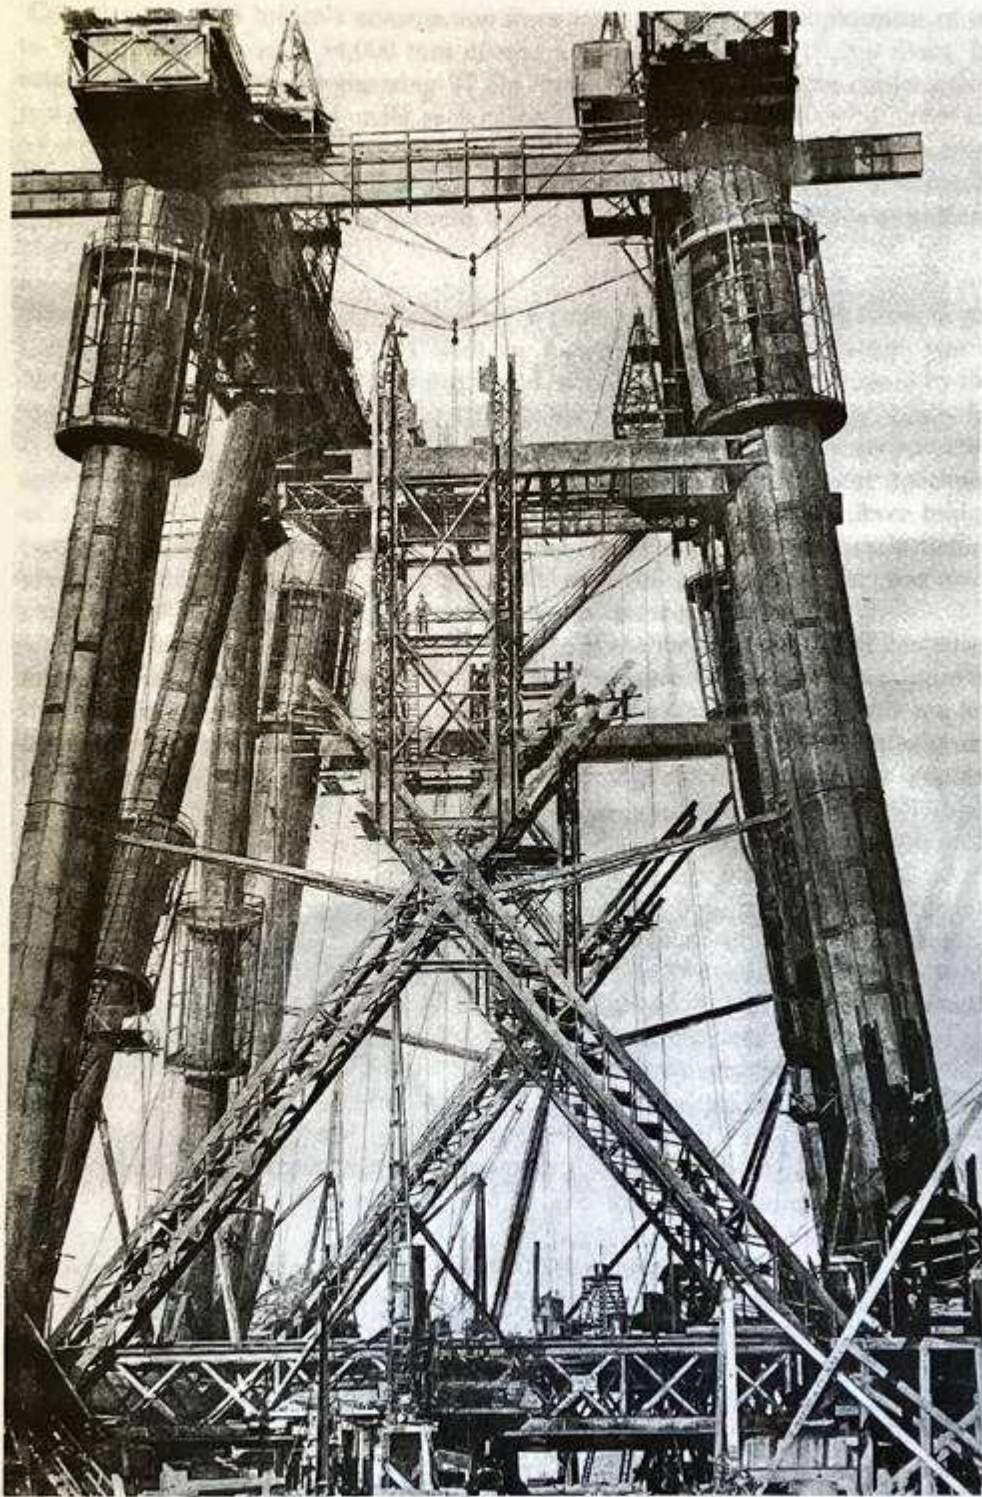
Queensferry Pier – Lifting Platform Raised 58 m. Note Figure on Gantry (1)
